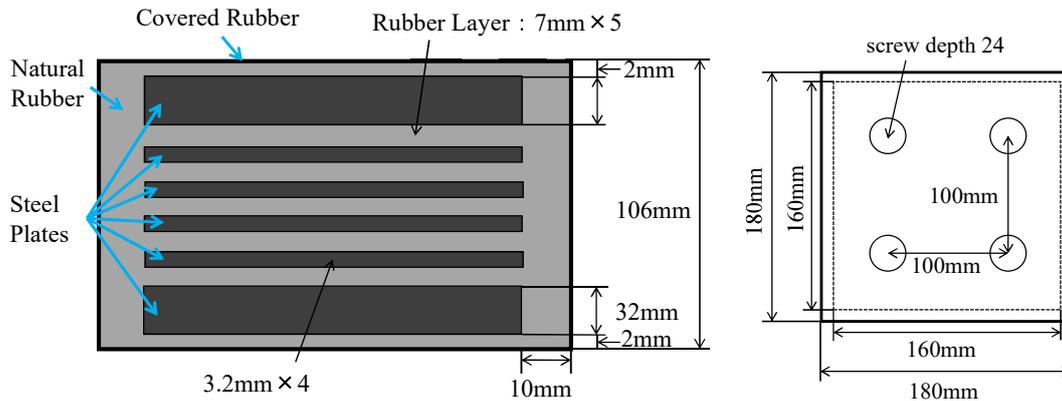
Outline of the specimen (left: cross-section view, right: top view)
